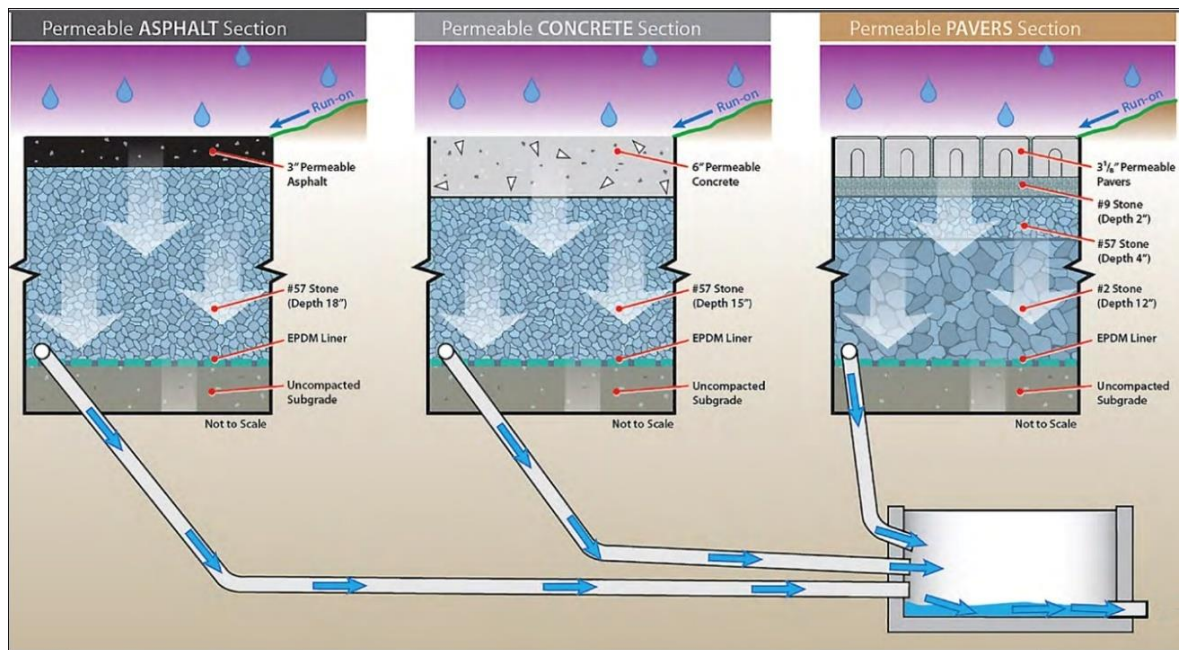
Asphalt, concrete, and pavers permeable surfaces (Selbig & Beur, 2018).
